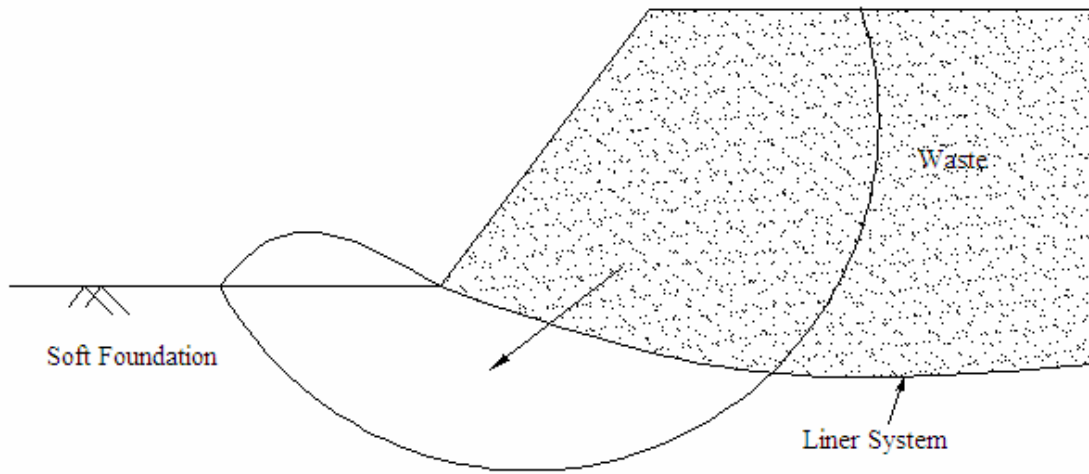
Foundation failure through subsoil, liner and waste
